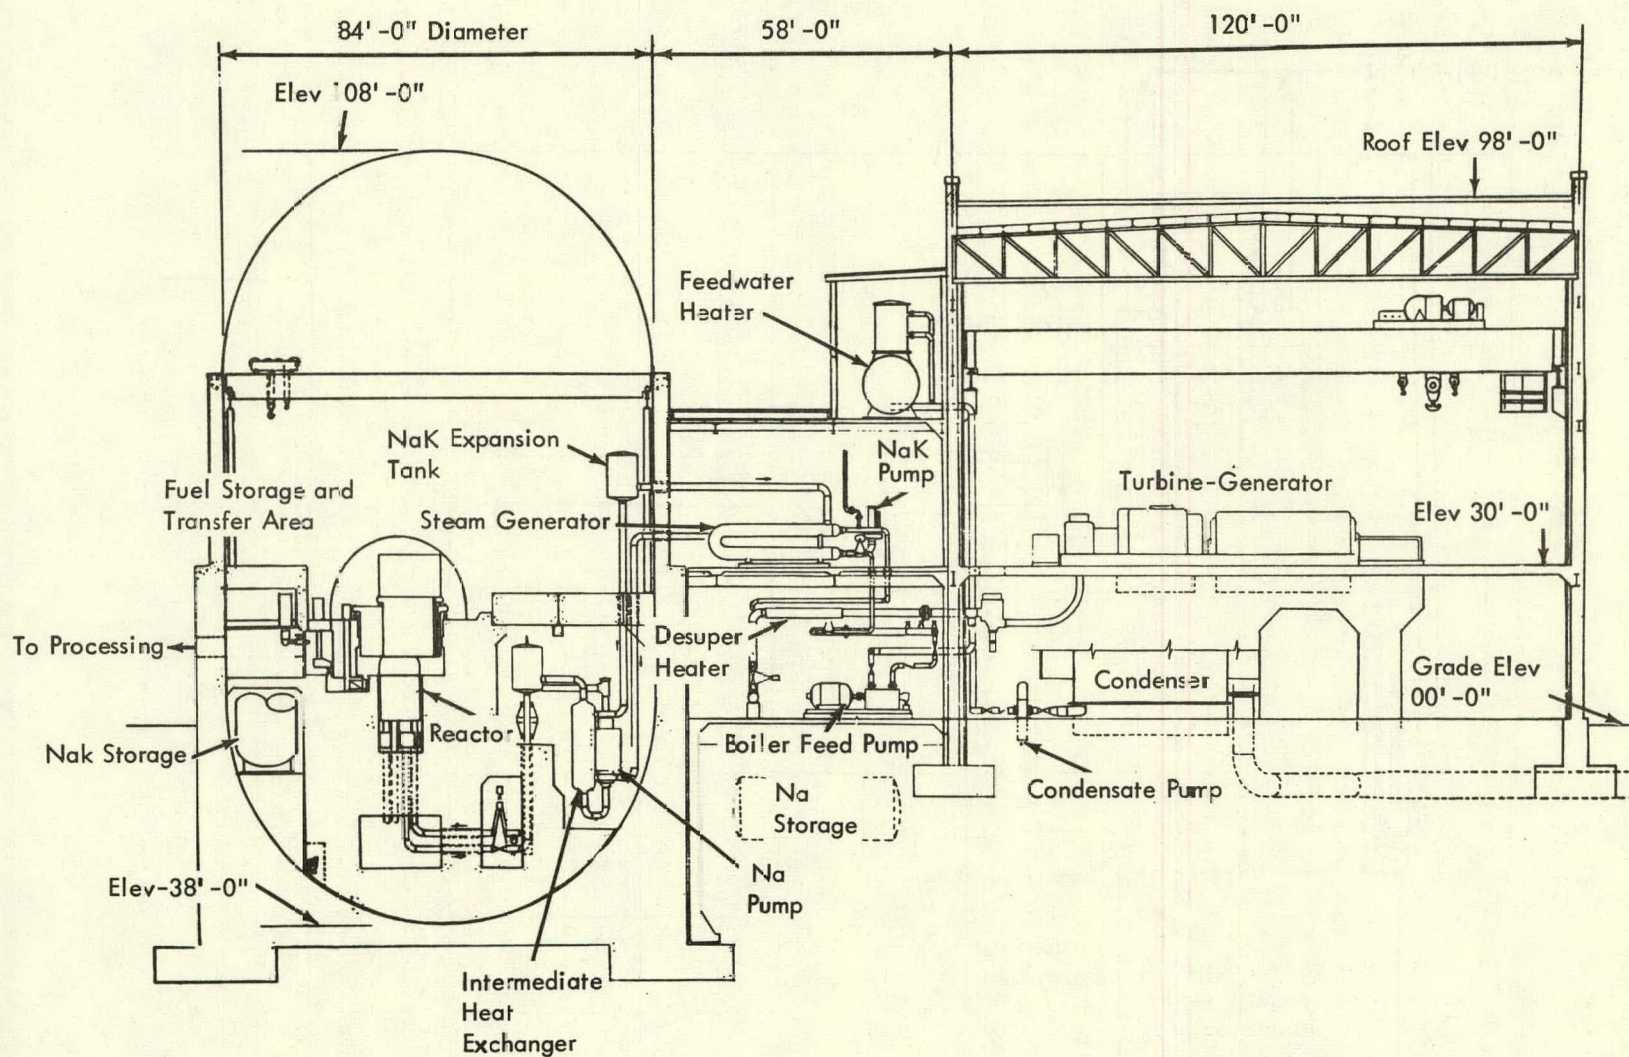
PLANT ARRANGEMENT INCORPORATING SEPARATE FUEL PROCESSING FACILITY AND VERTICAL PIPING LAYOUT, A 1953-54 CONCEPT
